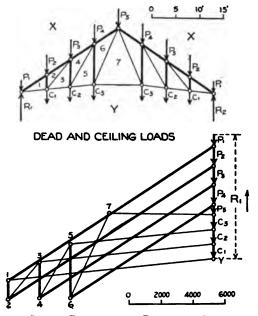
STRESS DIAGRAM FOR ROOF AND CEILING LOADS.
